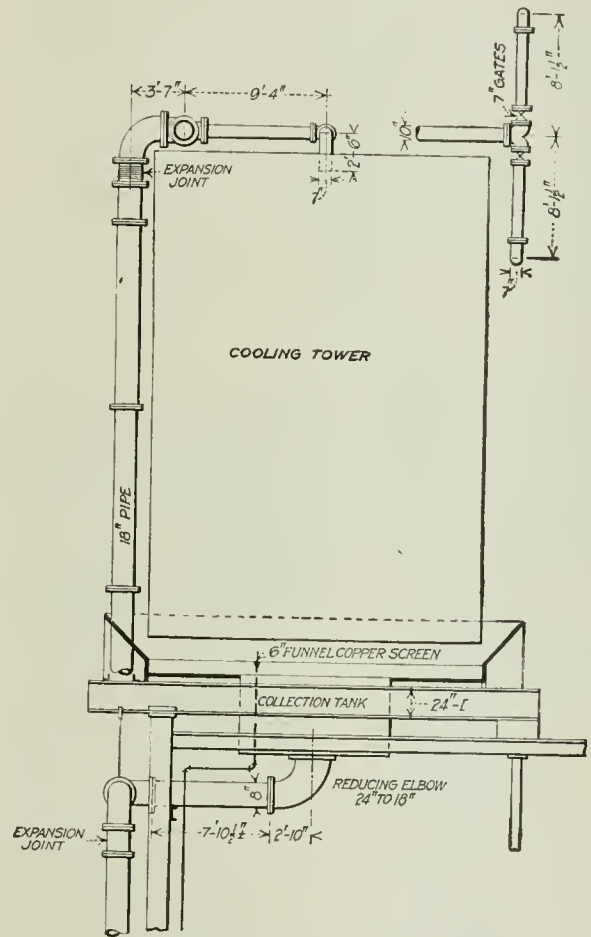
WATER CONNECTIONS AT COOLING TOWER
